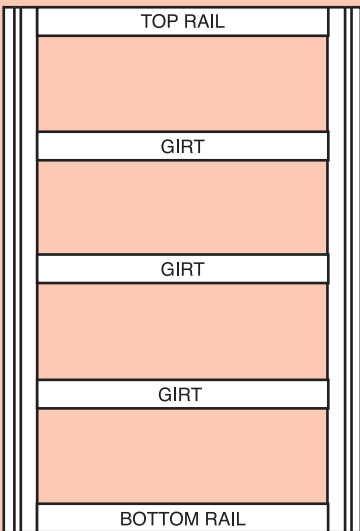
Always lay vertical rails and girts out on a flat, even surface for assembly. A bow or warp built into the door during construction will not disappear when it's hung.
